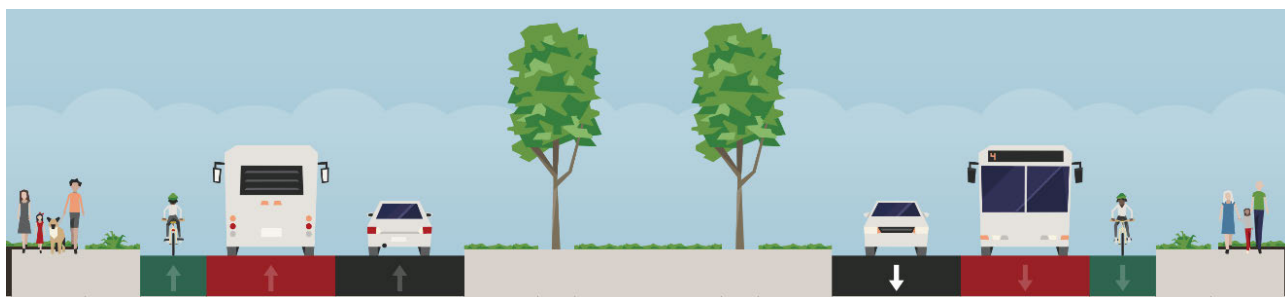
Typical cross section on Te Irirangi Drive with Option 4 with cycle facilities
